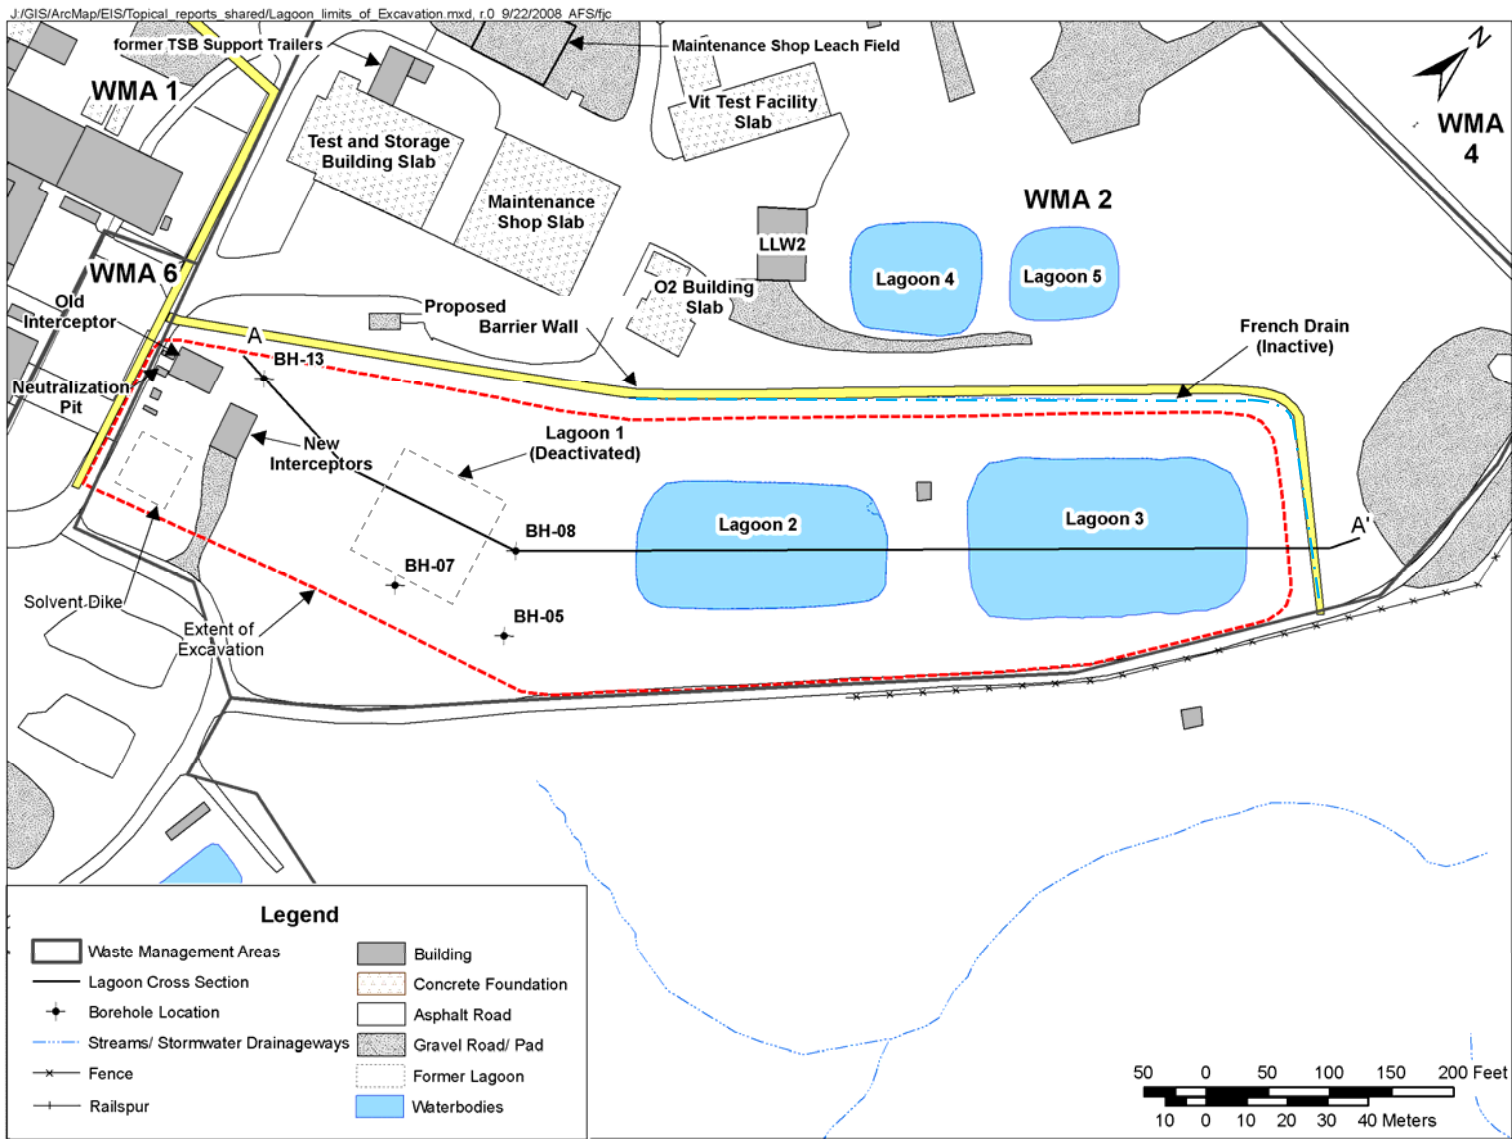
Conceptual Arrangement of WMA 2 Excavation, Plan View
